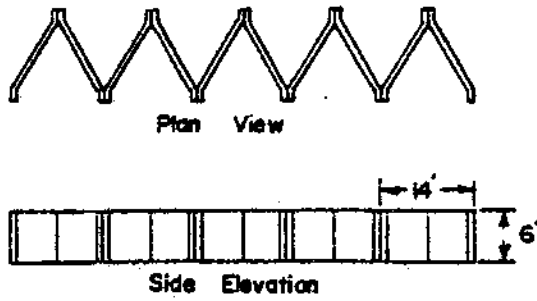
Precast Concrete Inshore Breakwater (Hanson, Perry and Wallace, 1978, p. 26)
